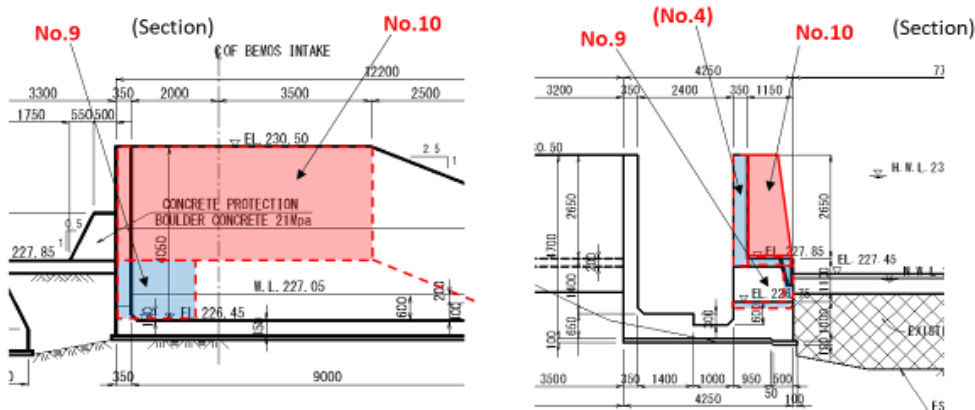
Rehabilitation Plan from No.9 to No.10
